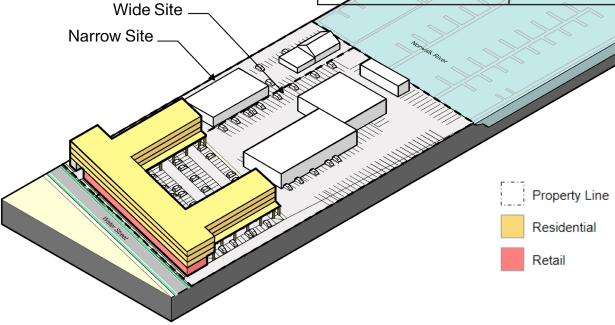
North Marine Commercial District - Composite Site - Test Fit
